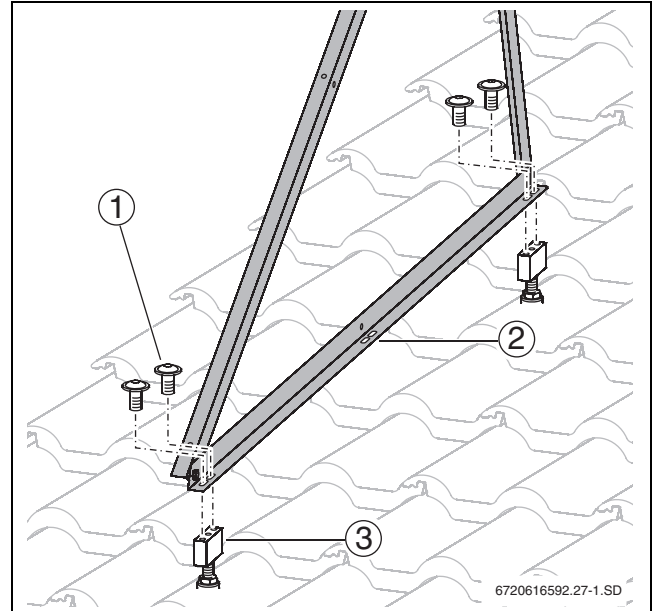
Roof connection with headless screws (here: on a roof with tiles)
